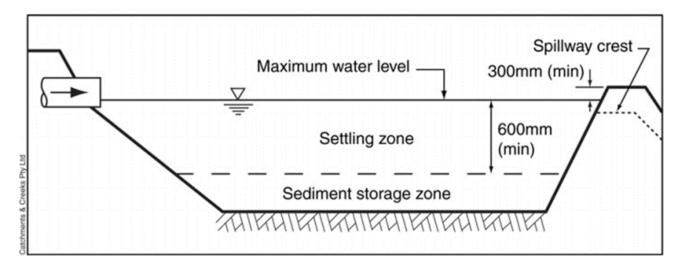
Typical section through Type D sediment basin (Source: IECA, 2008)
